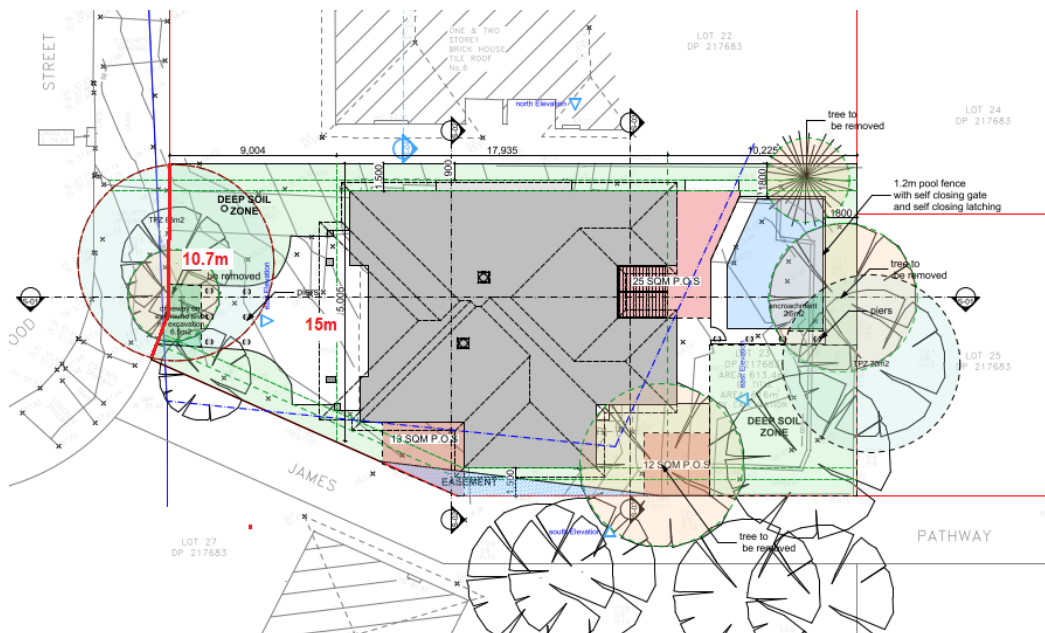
Plan depicting primary road frontage of 10.7m in red.
